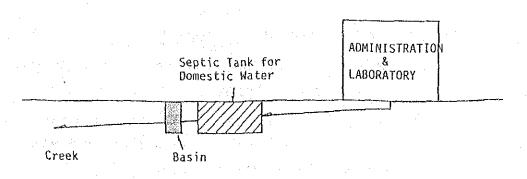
DRAINAGE SYSTEM DIAGRAM
